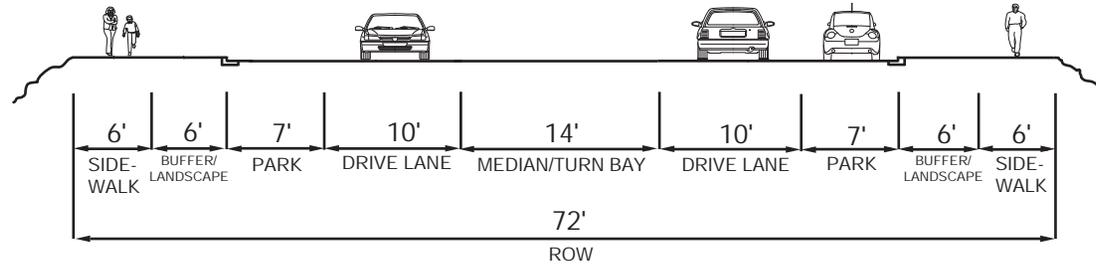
Street Type 2.2: Neighborhood Street B
